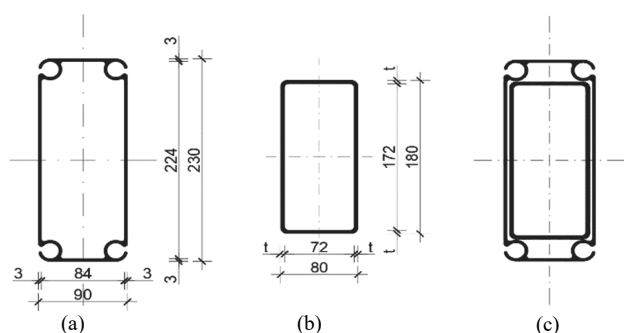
(a) aluminium profile; (b) steel insert; (c) cross-section at the knee joint [11] - Dimensions are in mm
